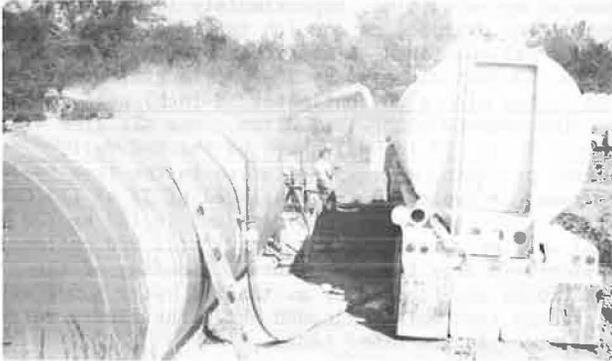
Jet slurry mixing plant-Dallas County, Texas (Ref 16).
